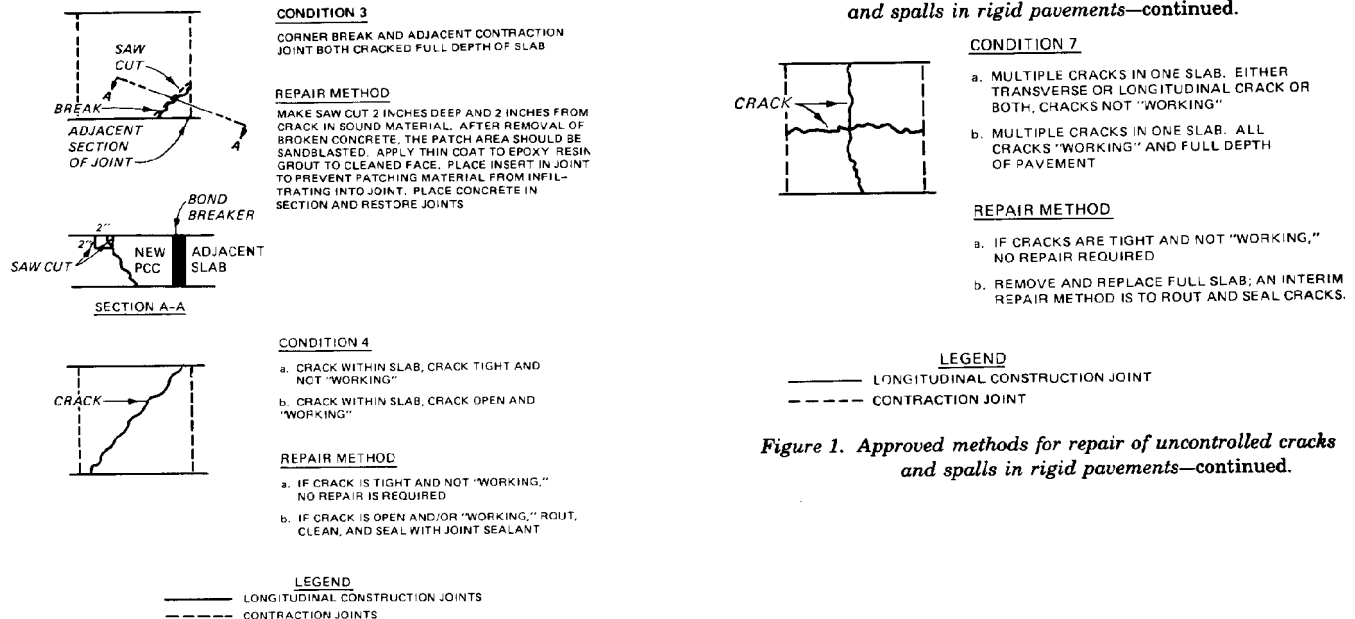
Approved methods for repair of uncontrolled cracks and spalls in rigid pavements—continued.
